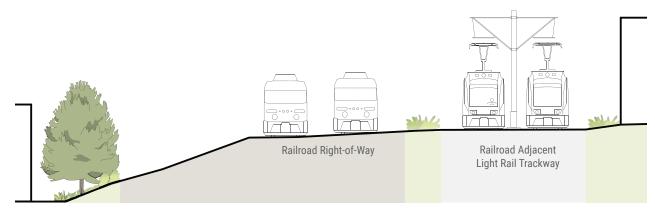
At-grade light rail trackway adjacent to existing railroad right-of-way
